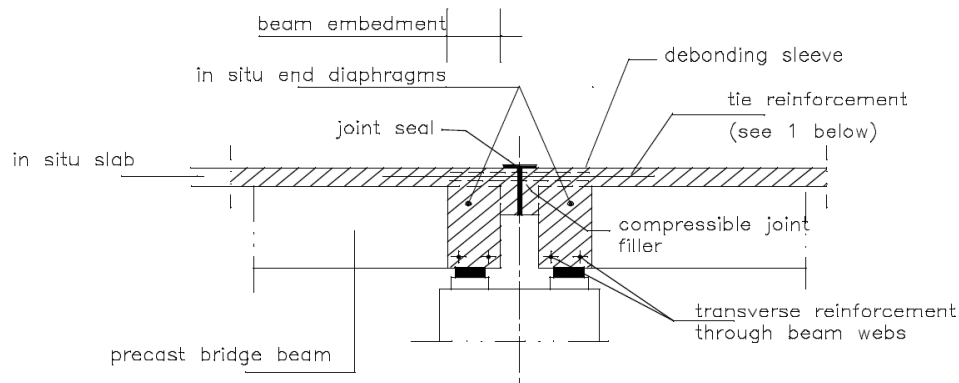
Detail of a simply supported bridge with continuous, tied, slabs (partial continuity; method 2) [68]
